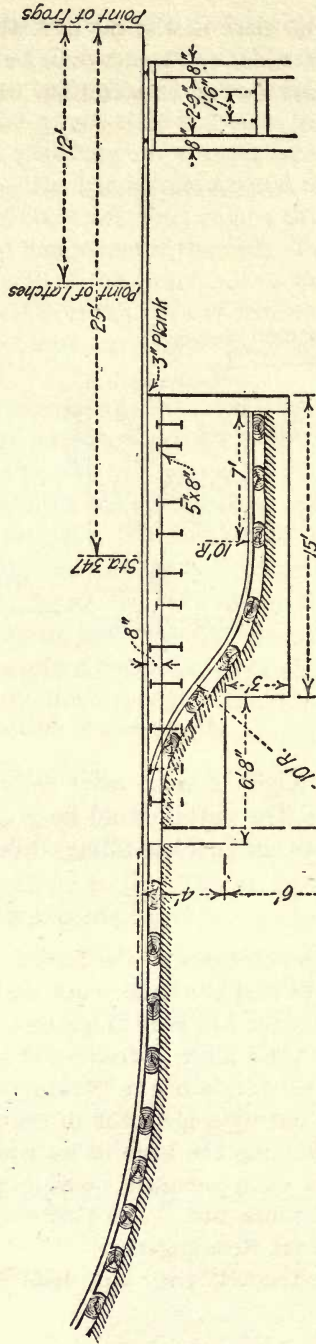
Cross-Section of Barney Pit at Foot of Plane
